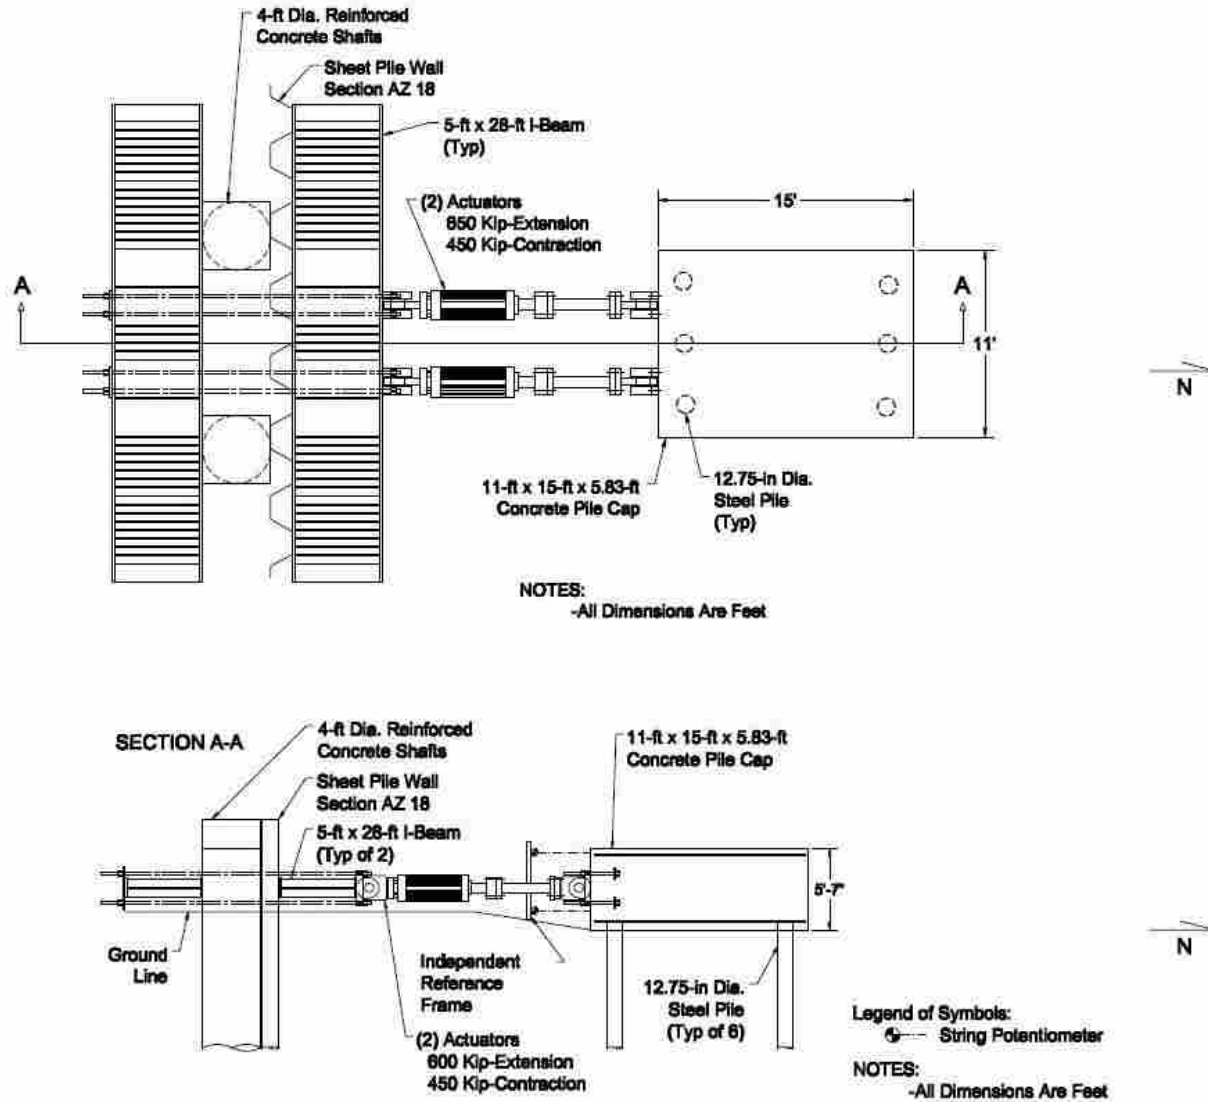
Aerial and Cross-section Views of the General Testing Layout
